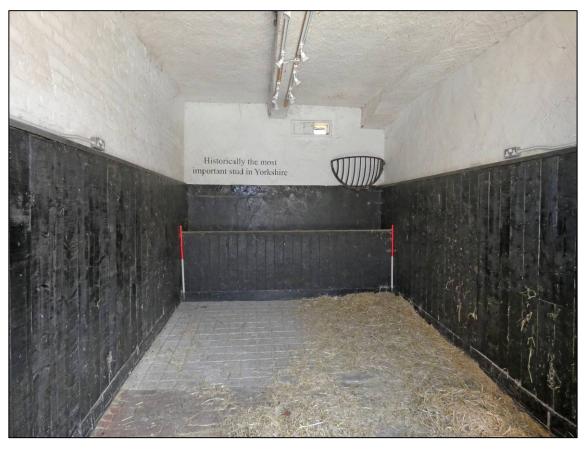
East range, ground floor loose box (GF3), looking NE (photo 1/716).
